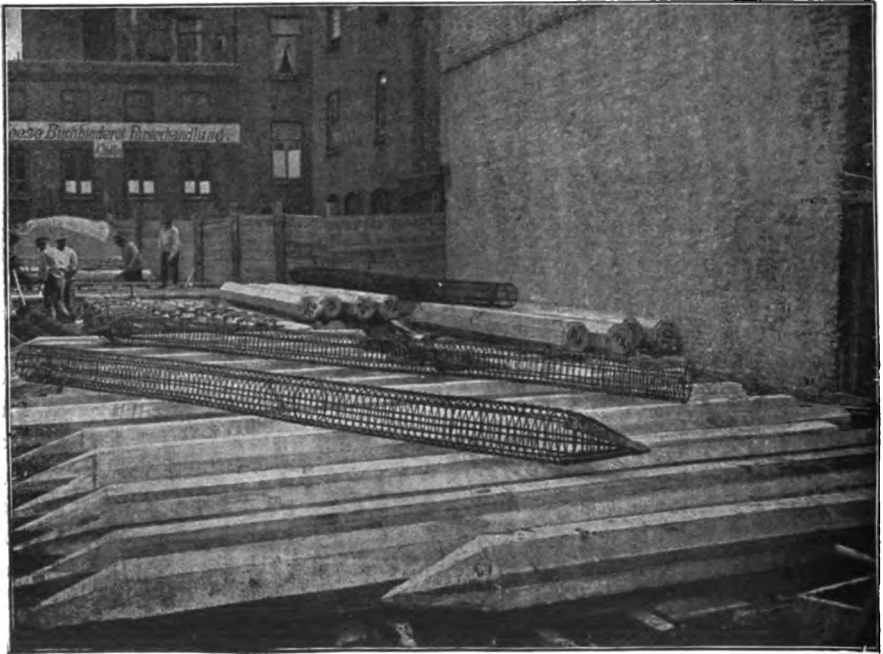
Behrend Building, Kiel. Stock of finished piles and some reinforcement units.
